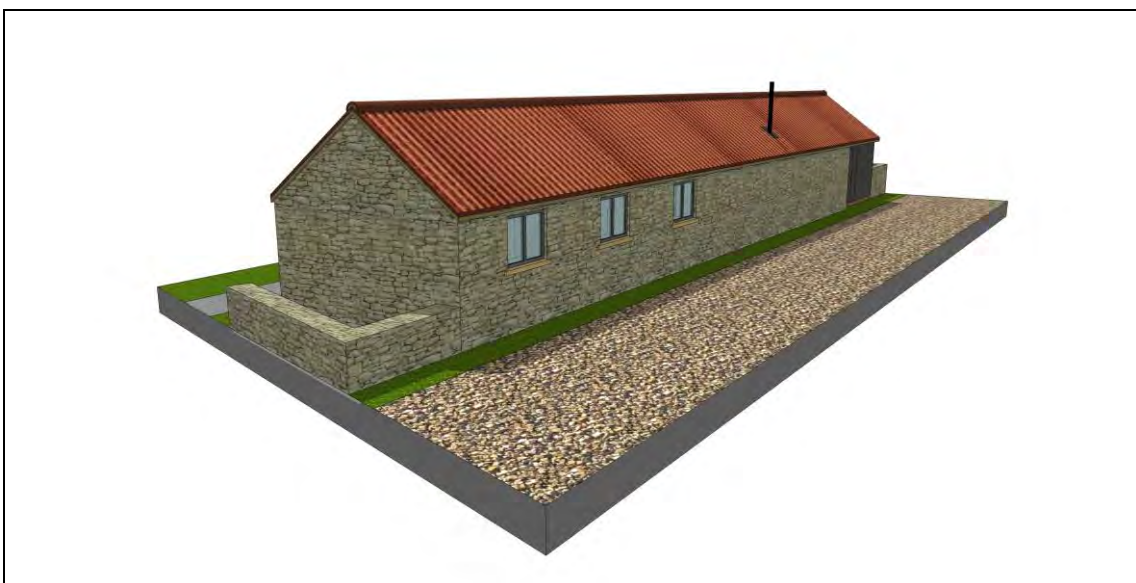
REAR ELEVATION VIEWED FROM SOUTH-WEST (PUBLIC VIEW)
